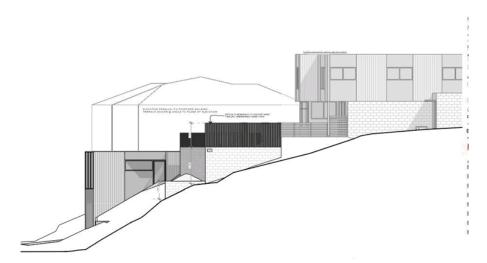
North elevation including retaining walls and terraces (Crump Architecture, 2022)
